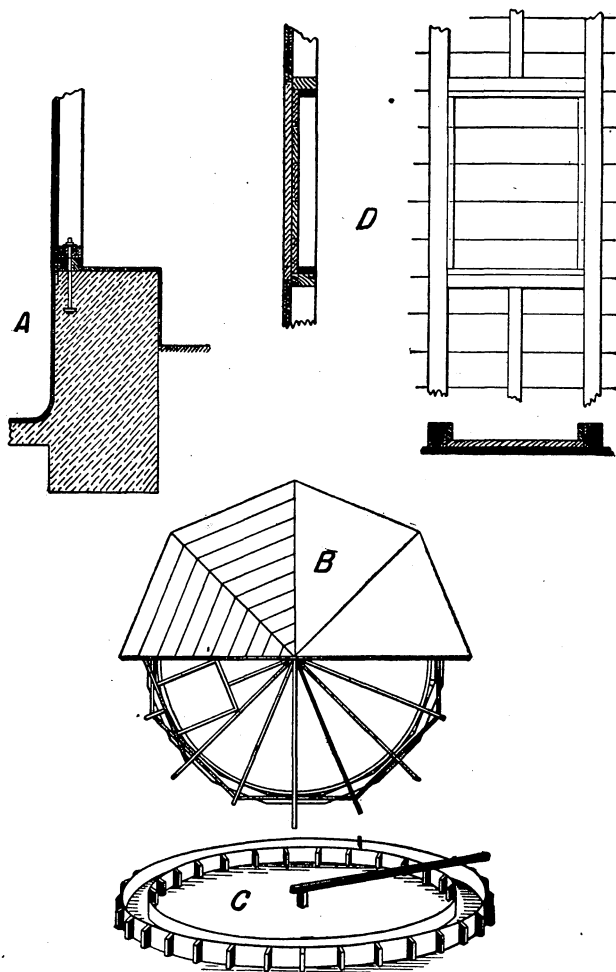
Details of construction of modified Wisconsin silo shown in fig. 24.
